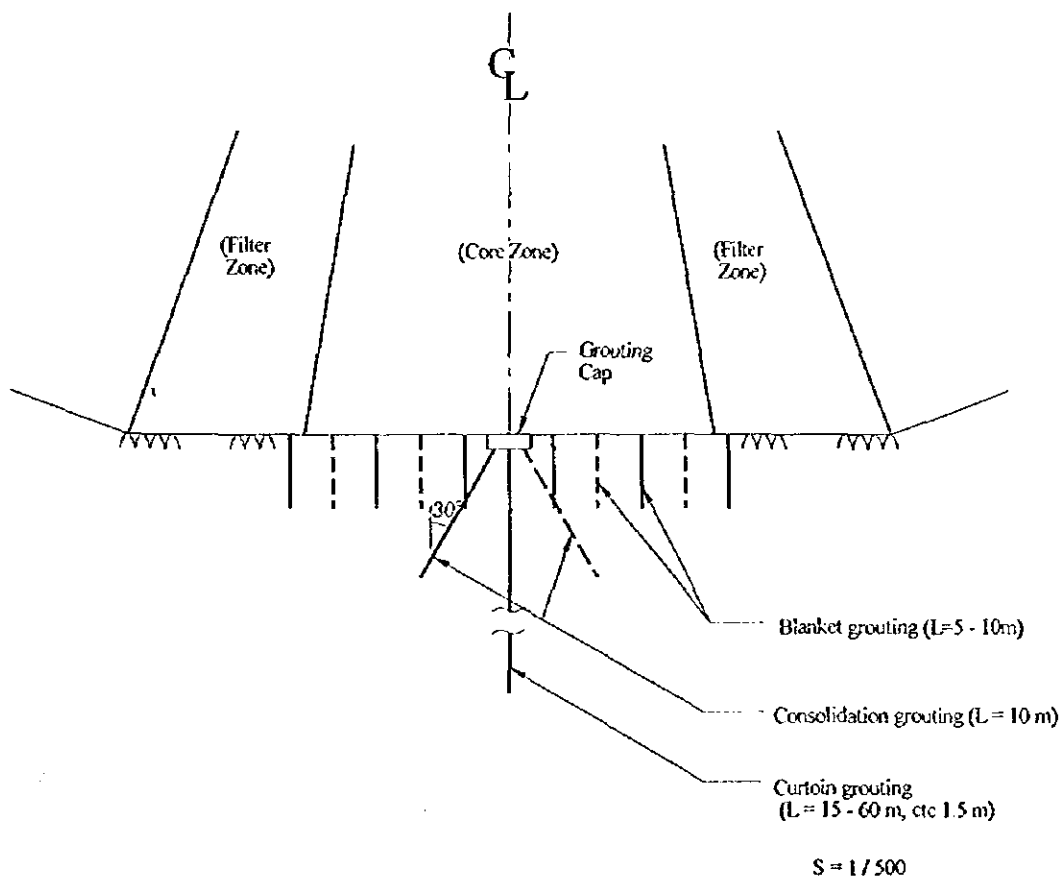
8 (2) Cross Section of Grouting Work
